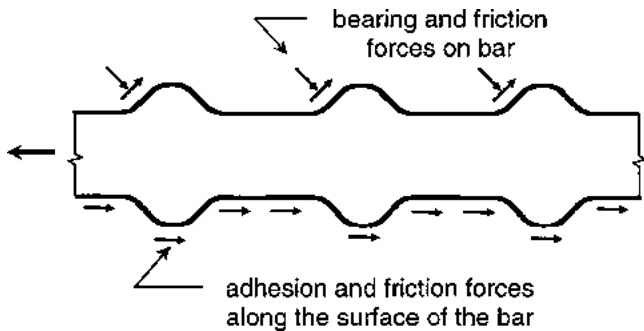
Transfer forces of embedded reinforcement in tension (Joint ACI-ASCE Committee 408 2003).
